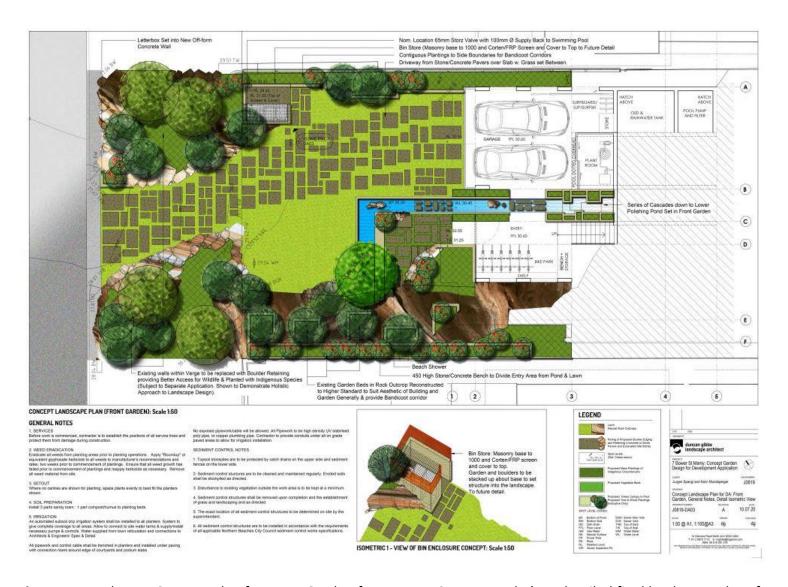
Landscape Concept plan for Front Garden for 7 Bower Street, Manly (see detailed final landscape plans from Duncan Gibbs Landscape Architect 10/07/2020)
